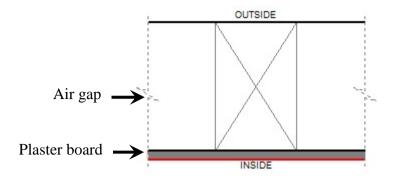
Arrangement of layers in uninsulated plaster ceiling
